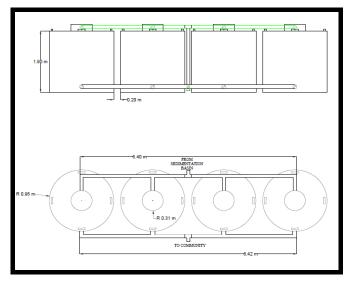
Plan and profile view of installed 5,000 L storage tanks
